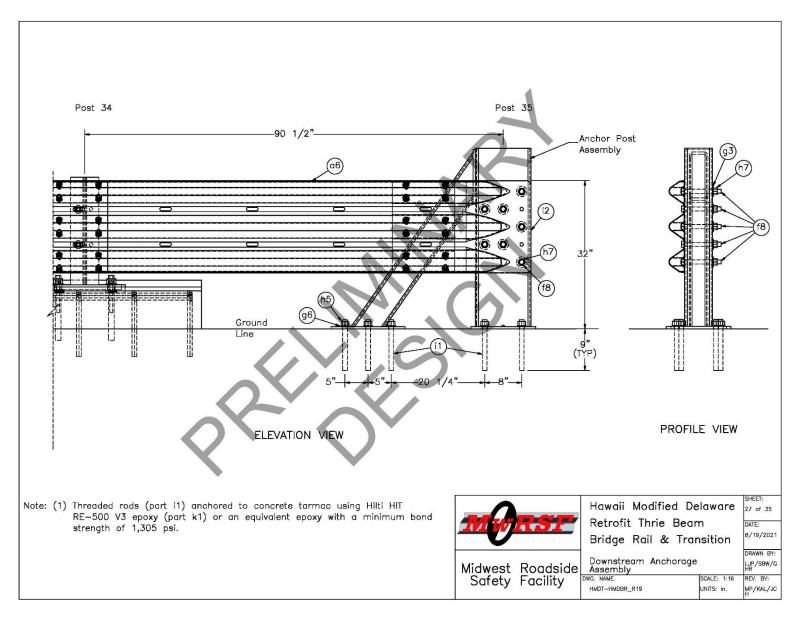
Downstream Anchorage Assembly, Test No. HMDT-1
